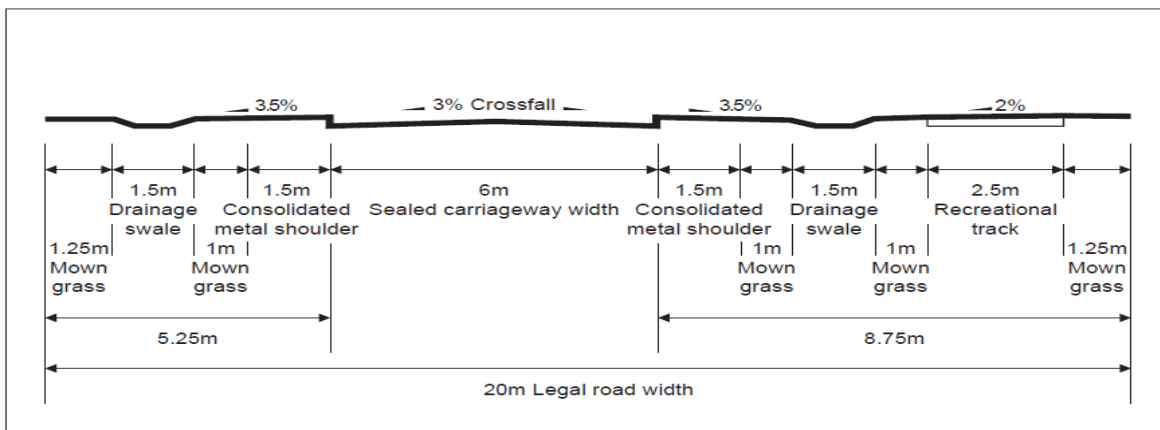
Proposed road - re-vegetation area
